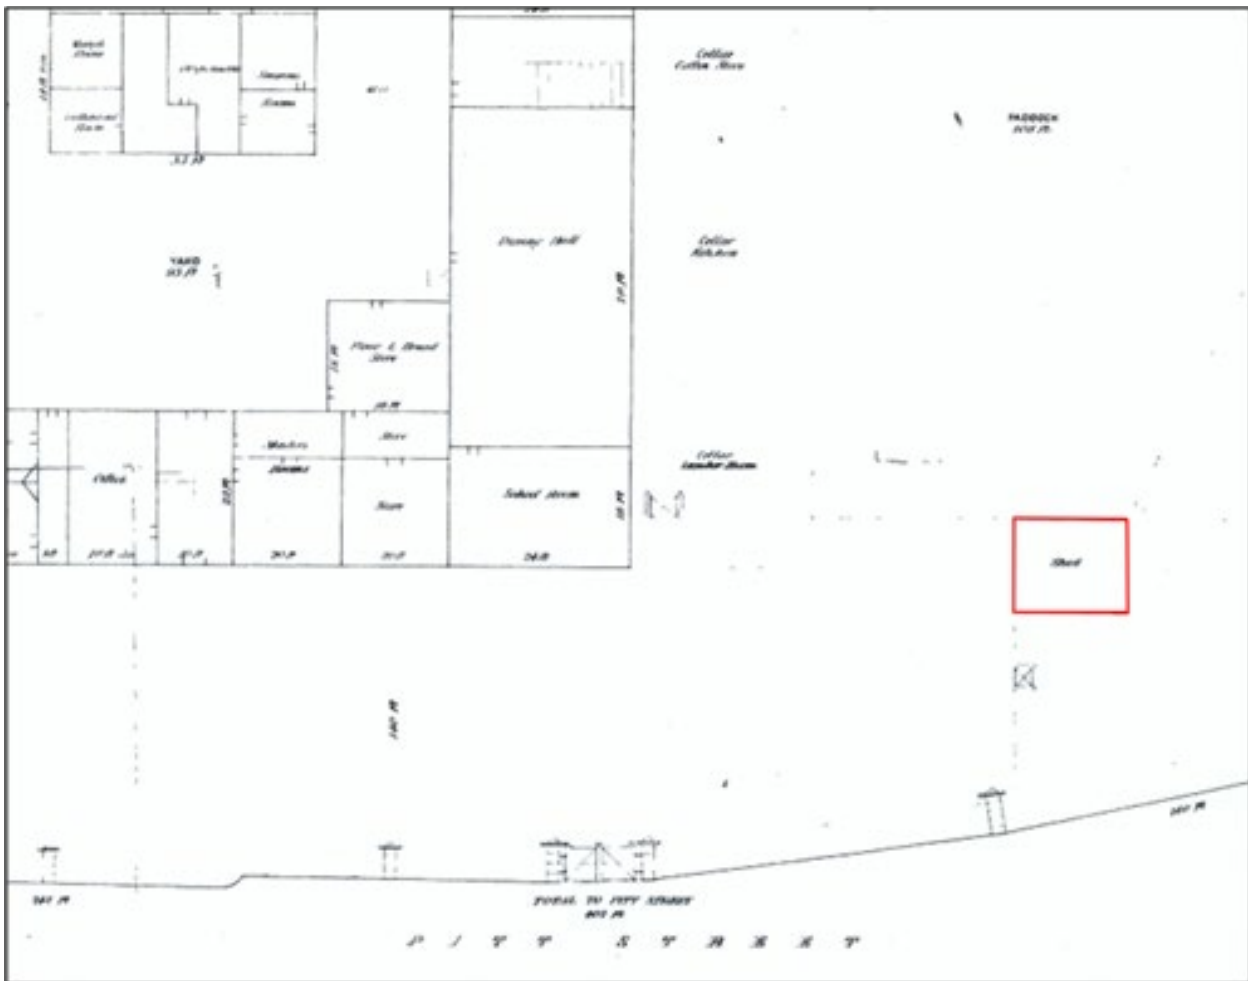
Detail of the plan of the ground floor and grounds of the asylum showing the structure depicted on the 1855 plan and shown in the birds-eye view (Figure 3) as a shed (outlined red). Annotations describe the basement rooms beneath the dining hall and stairs. The plan is not to scale but instead shows distances between structures and dimensions of rooms.
